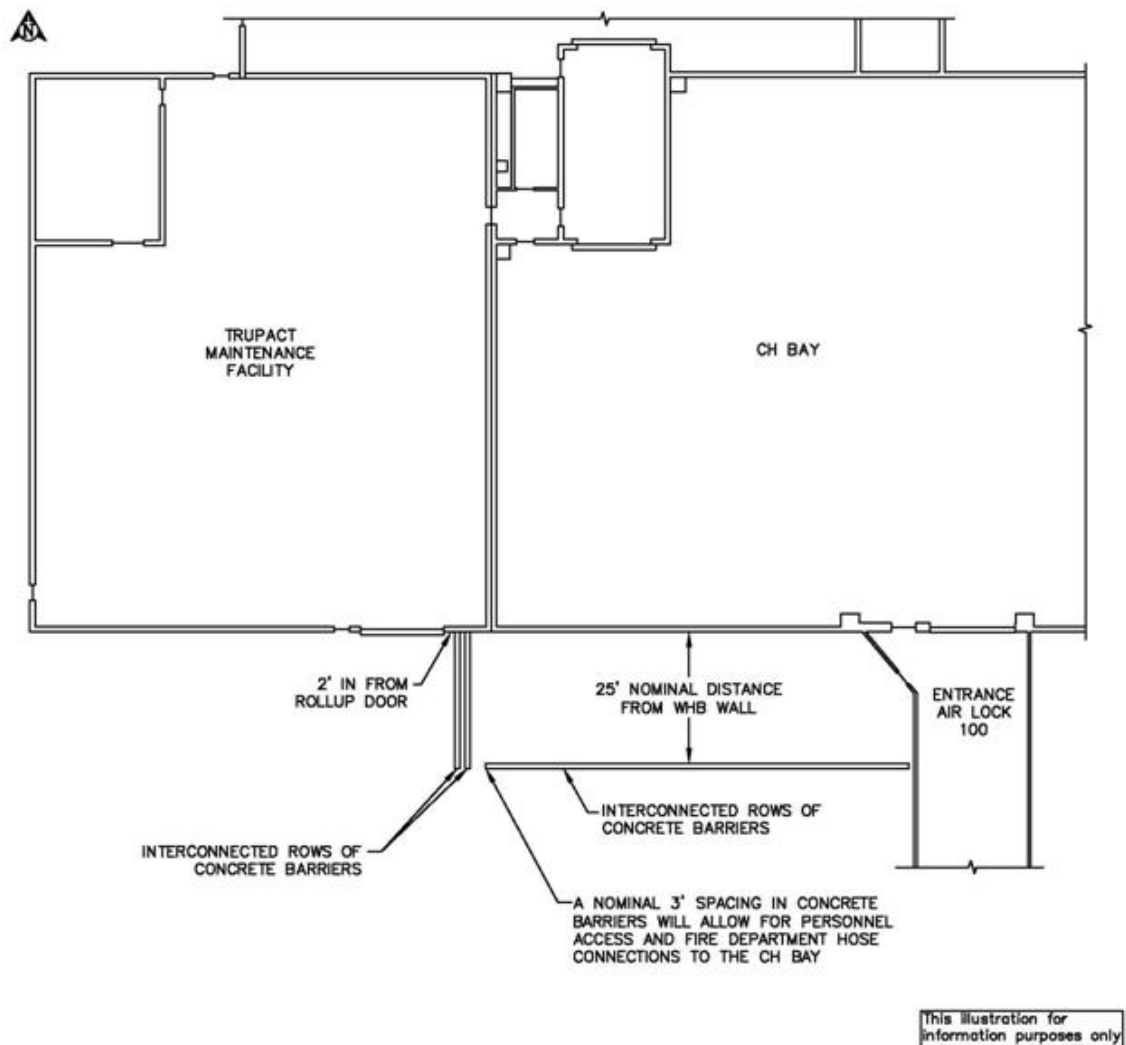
Waste Handling Building South Wall Vehicle Barrier Configuration
